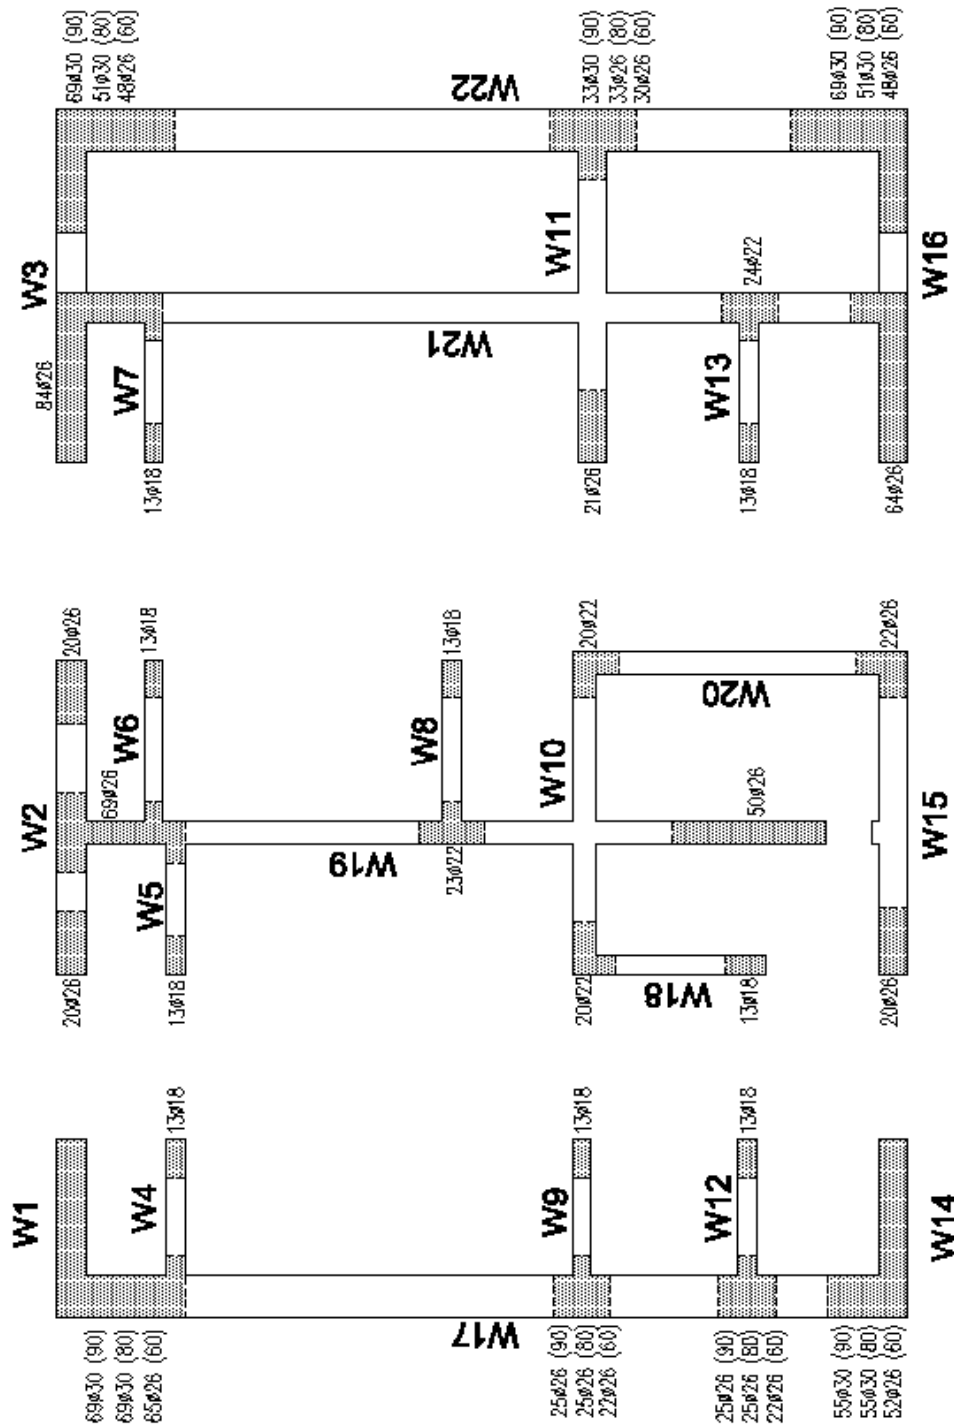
Thickness and Labels of Walls of Case Building in Istanbul
